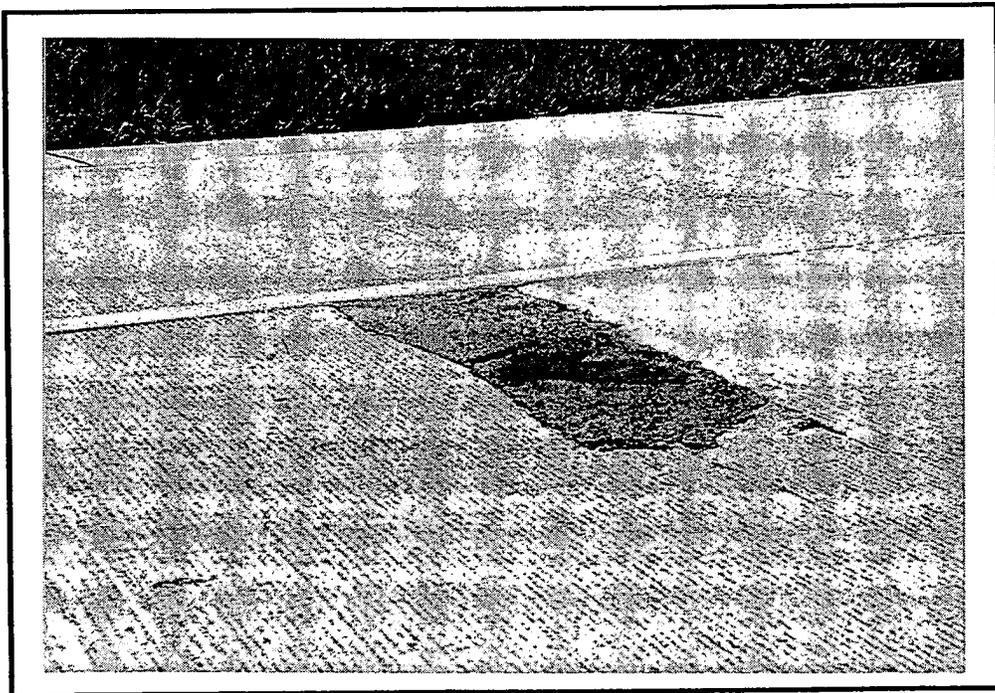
Patching in Jointed Concrete Pavement, High Severity
